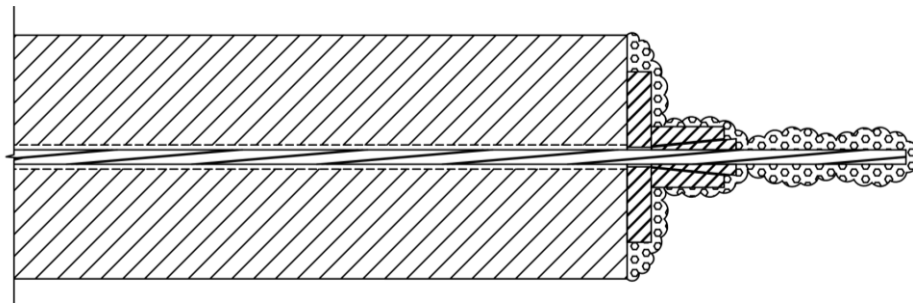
Kaowool protected post-tensioning anchorage longitudinal section drawing.
